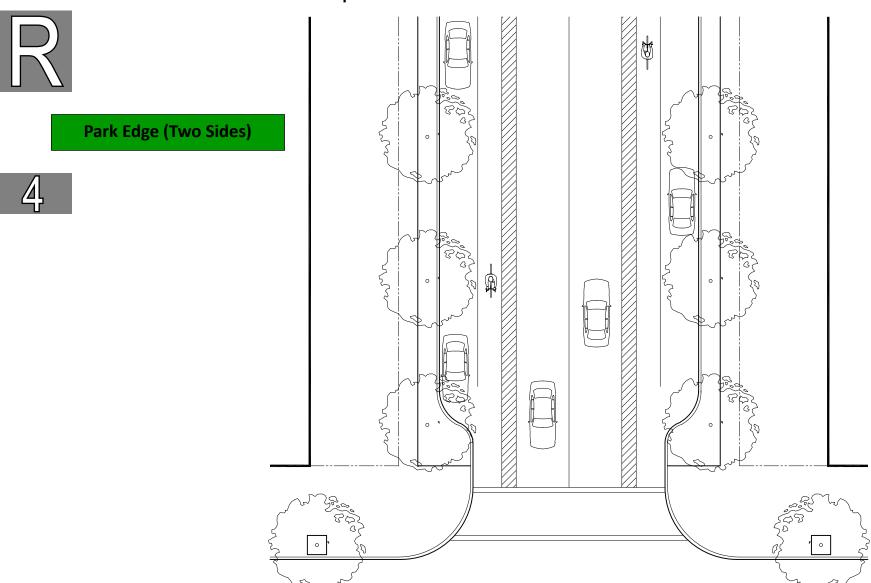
Street Type 4.2: Typical Intersection (Plan Perspective)
